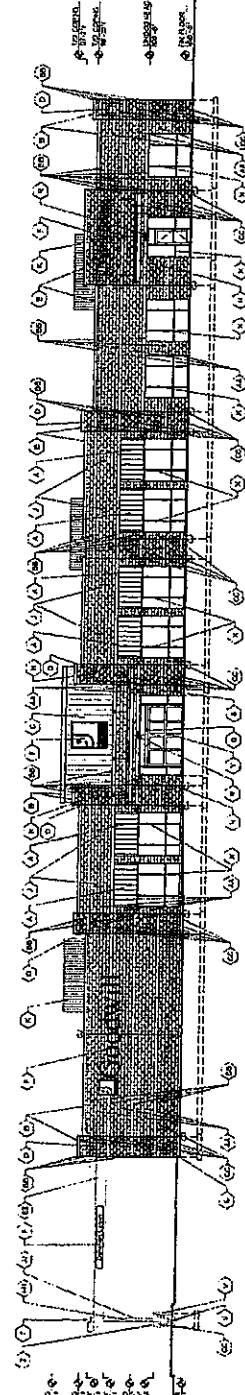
EXHIBIT F: PRELIMINARY BUILDING ELEVATIONS
